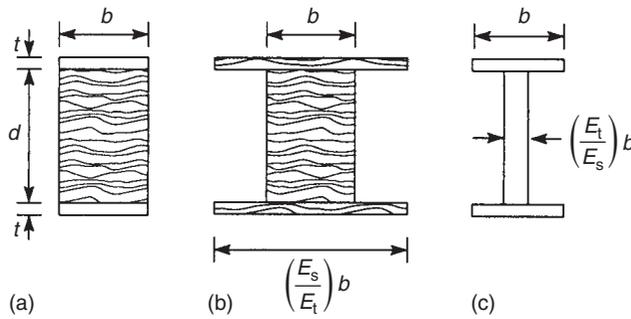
Reinforced timber beam with steel plates attached to its top and bottom surfaces
